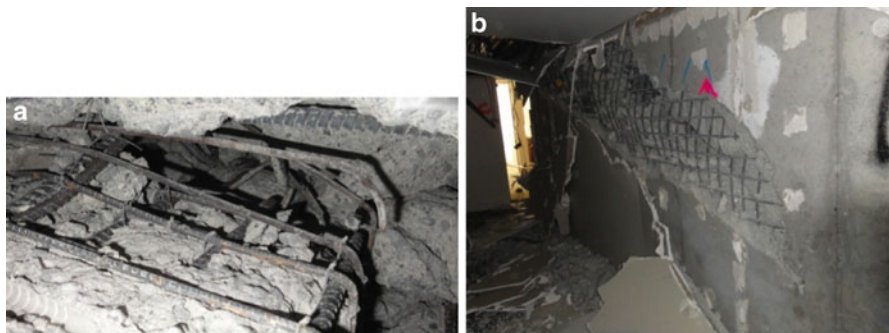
Boundary bar fracture (a) and web crushing (b) in modern 8-story apartment building
